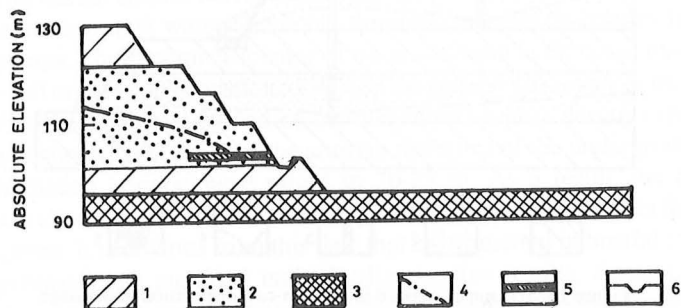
Scheme of drainage of non-working benches by means of horizontal drainage wells
